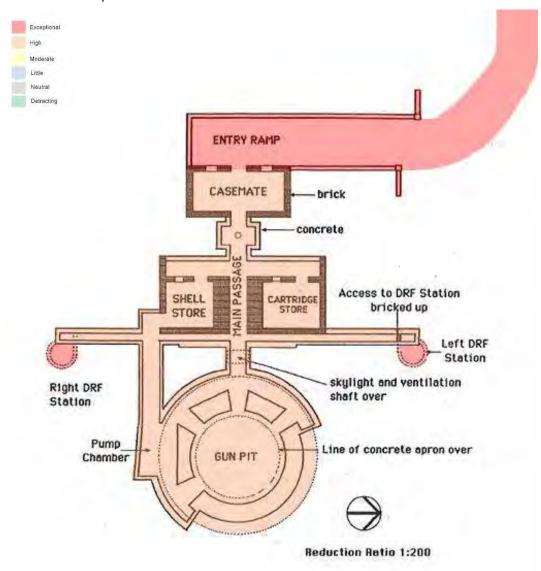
Diagram of the gun pit and associated above and underground structures showing the significance ranking of each element. (Source: Shepherds Hill Cottage and Surrounds, Conservation Study, Gardner Browne, 1984)
